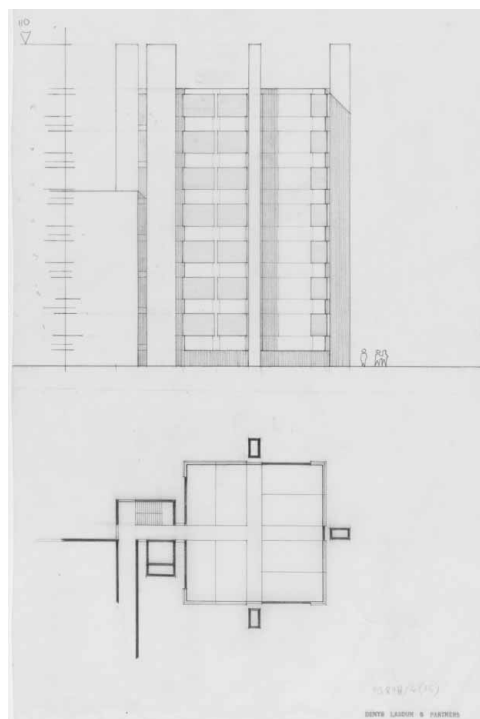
Unbuilt scheme for science towers on the New Museums Site, Cambridge, Denys Lasdun & Partners, c. 1961. The sketch shows in plan and elevation the separation of hollow vertical structural columns, which were to carry services. (Lasdun Archive/RIBA Library Drawings Collection.)
